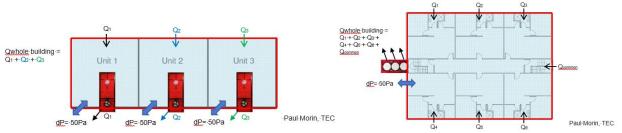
Whole building test for garden-style (left) and common entry (right) buildings
